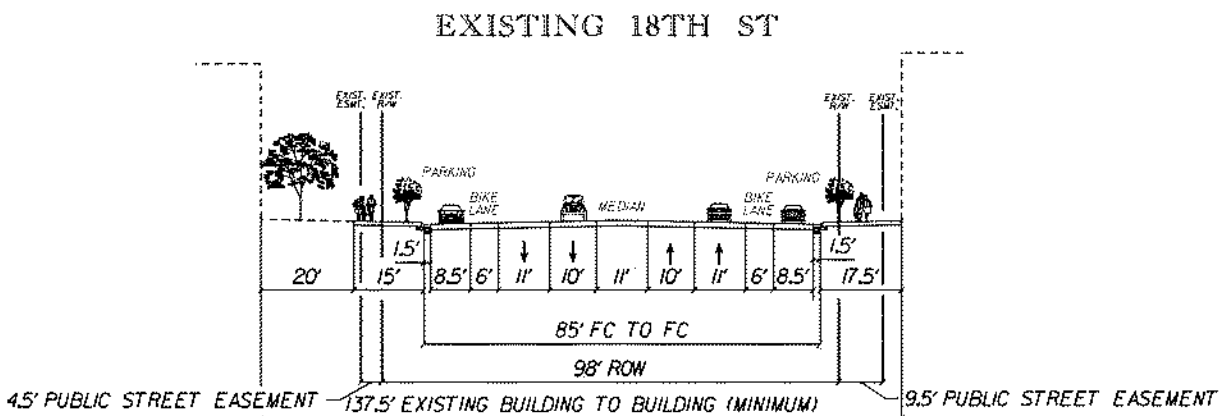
Existing 18th Street S Cross Section (looking east toward Route 1)
